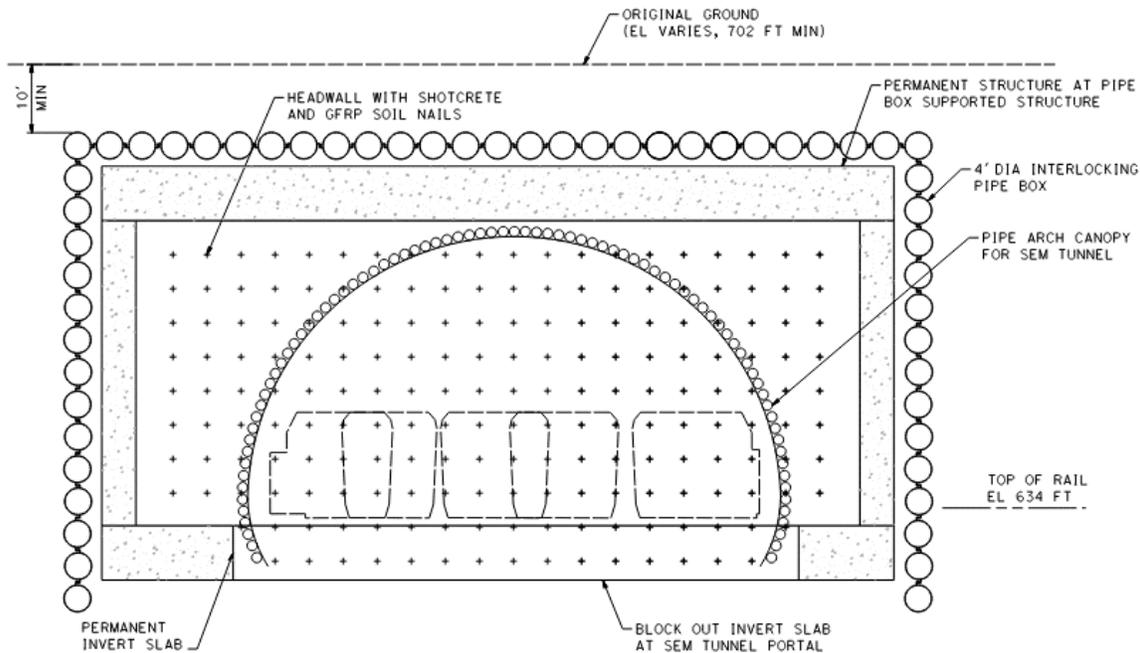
Typical Cross Section of Box Tunnel Excavation with Interlocking Pipes
